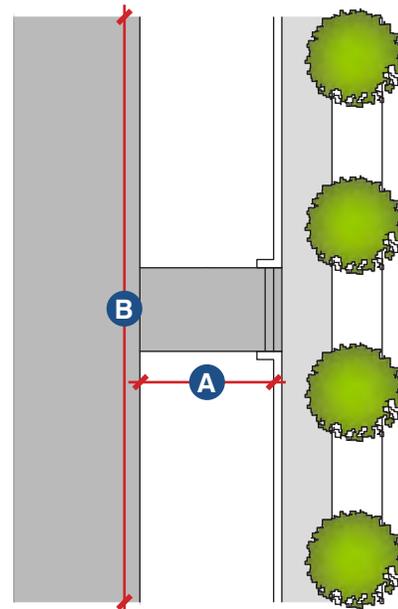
FIGURE: DOORYARD FRONTAGE PLAN VIEW DIAGRAM
